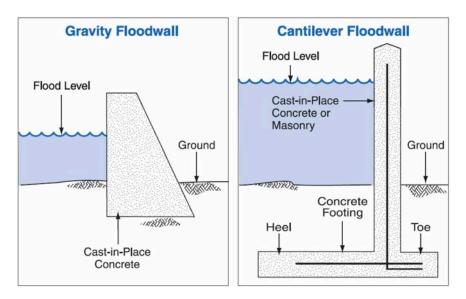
Gravity and cantilever flood walls (FEMA, 2009)
